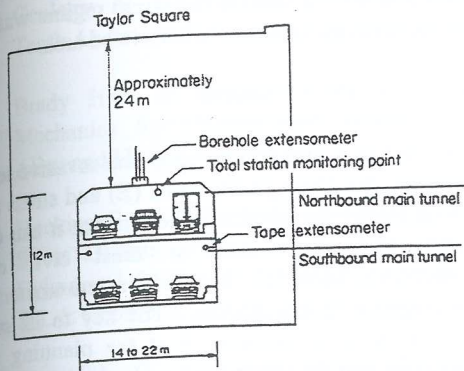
Typical Tunnel Cross Section with Monitoring Array
